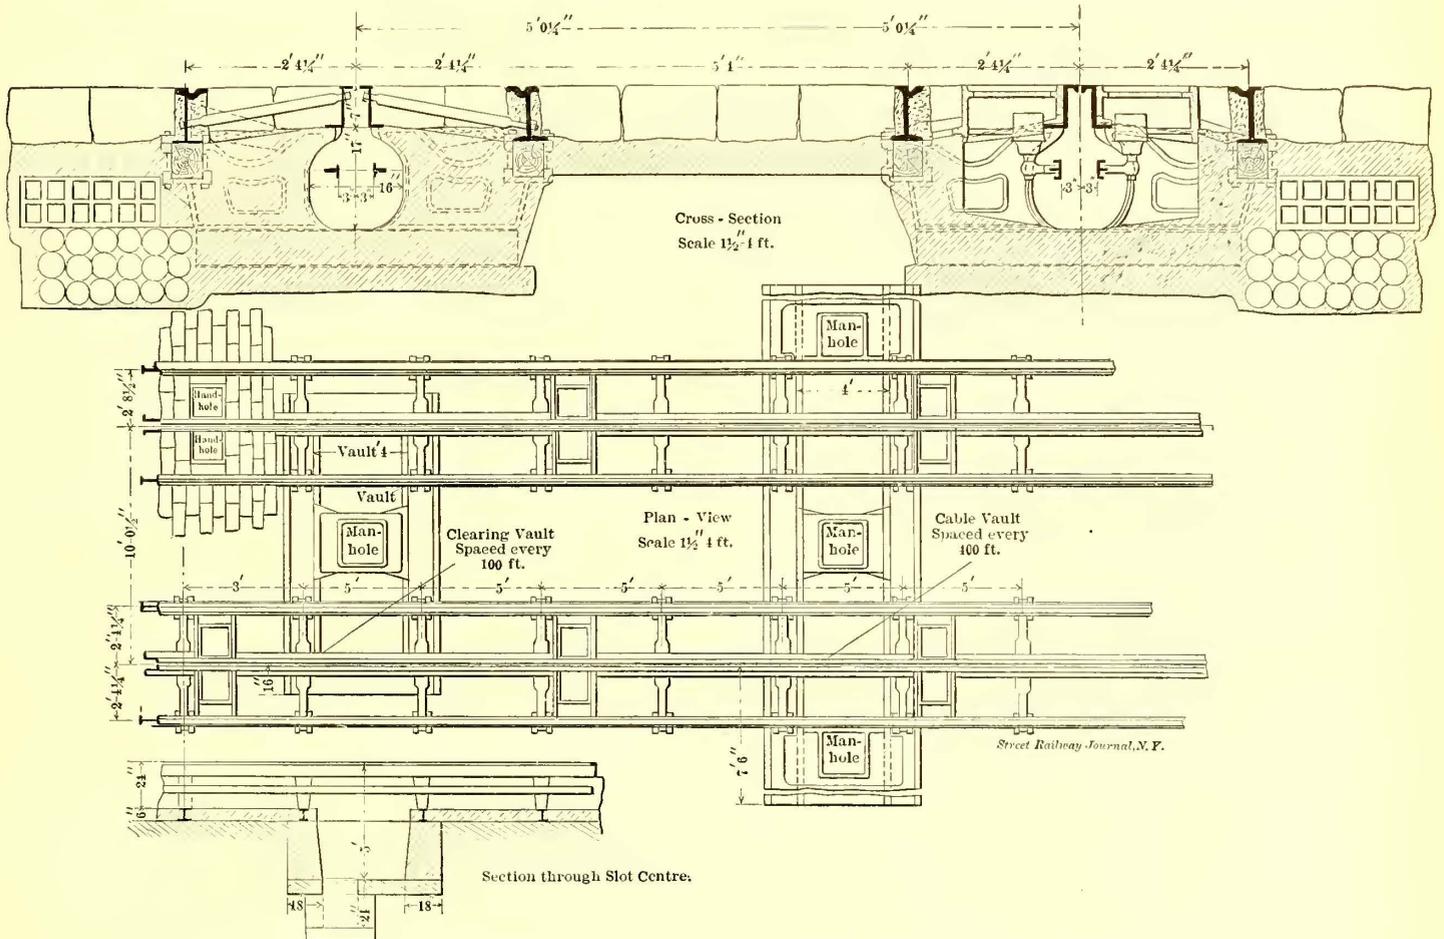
PLAN AND SECTIONS OF STANDARD NEW CONSTRUCTION, THIRD AVENUE RAILWAY
